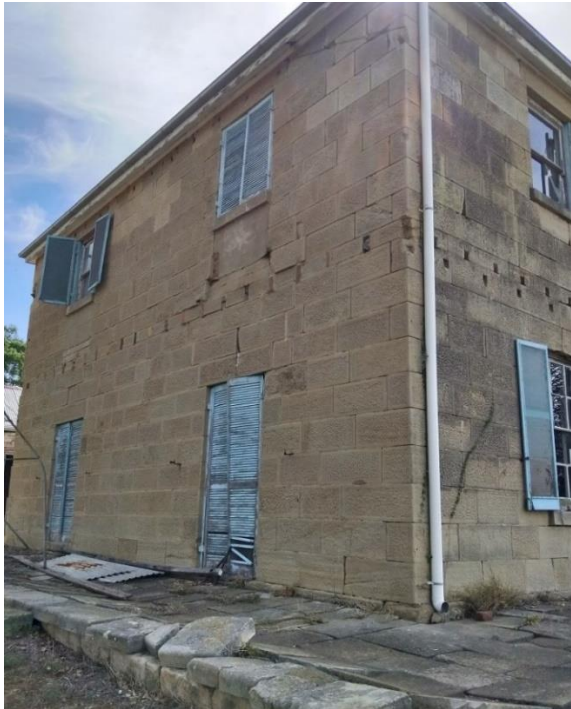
The western elevation of the sandstone section of Negoa, showing the upper windows (originally French doors but since filled in and replaced with the removal of the verandahs). The pictured windows are not original but are still of Considerable significance. Photograph taken April 2018.
